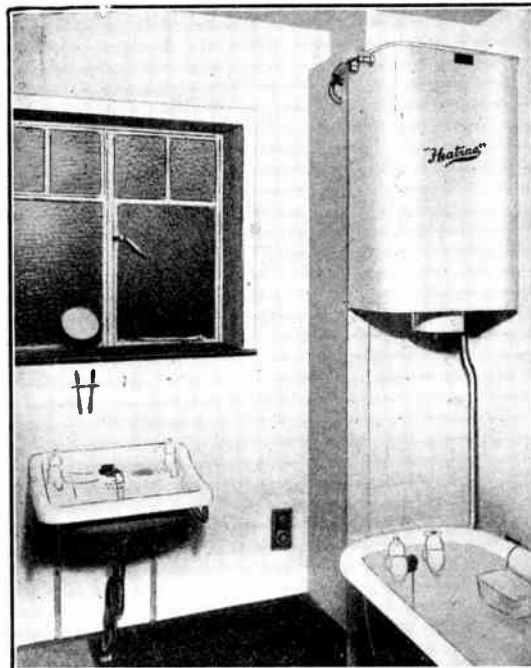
A CISTERN TYPE STORAGE HEATER INSTALLED IN A BATHROOM.
